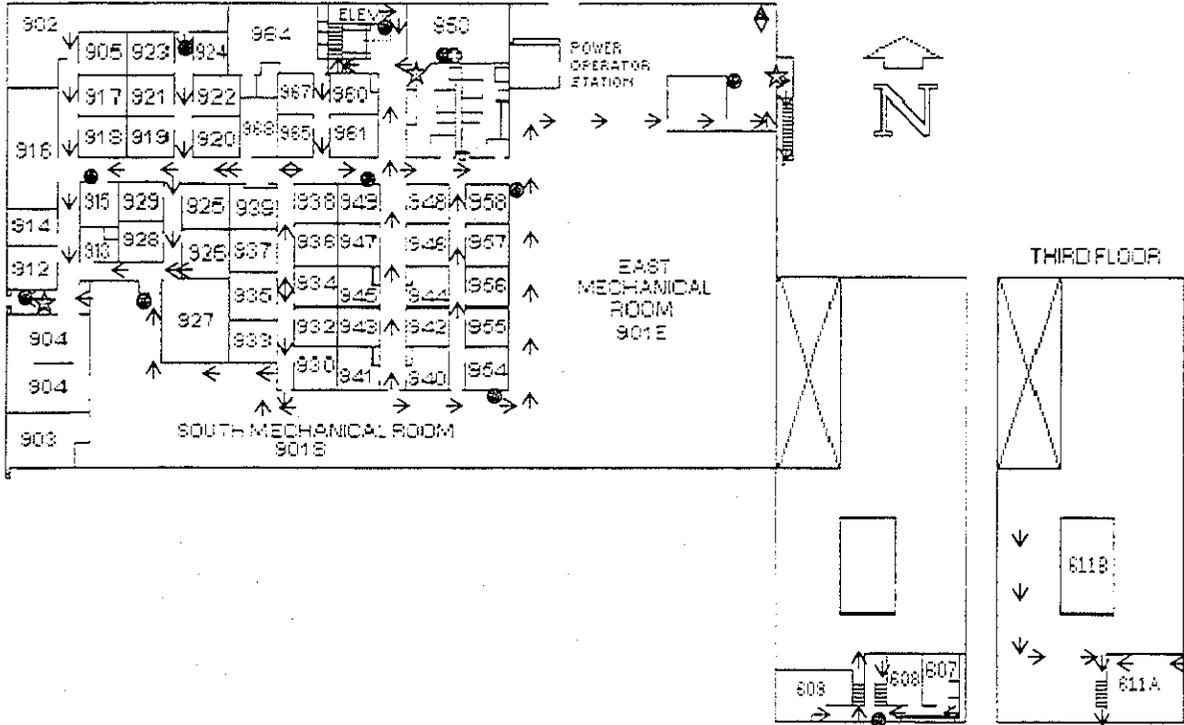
Emergency Equipment Locations - 1st Floor
